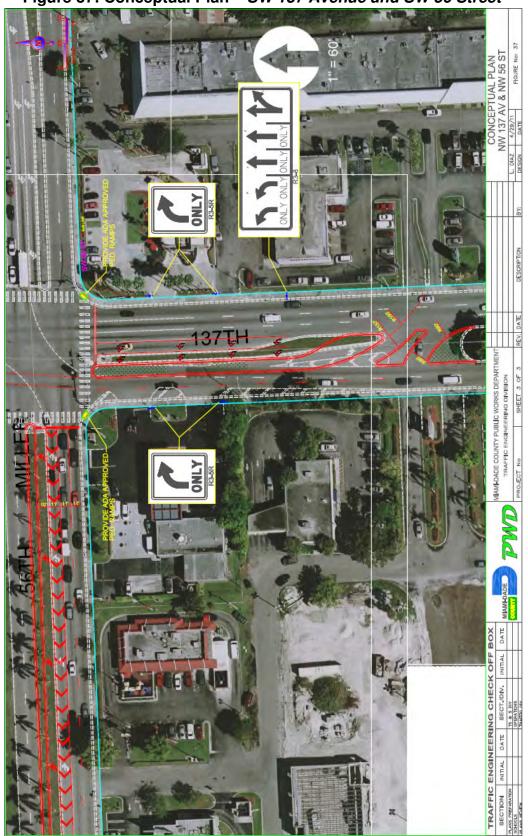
Conceptual Plan – SW 137 Avenue and SW 56 Street
